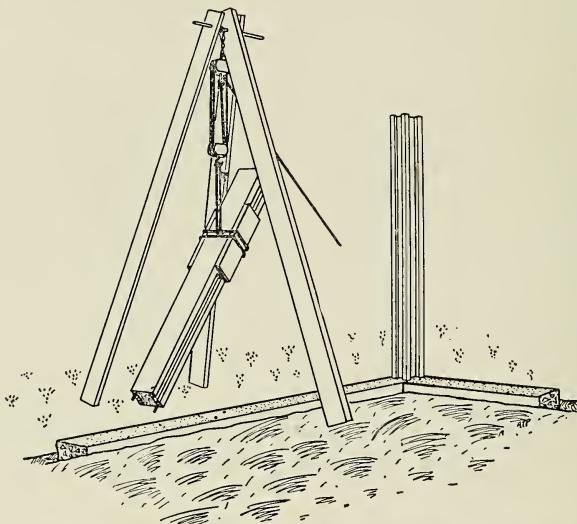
Tripod, Block and Tackle for lifting and placing columns and slabs.
